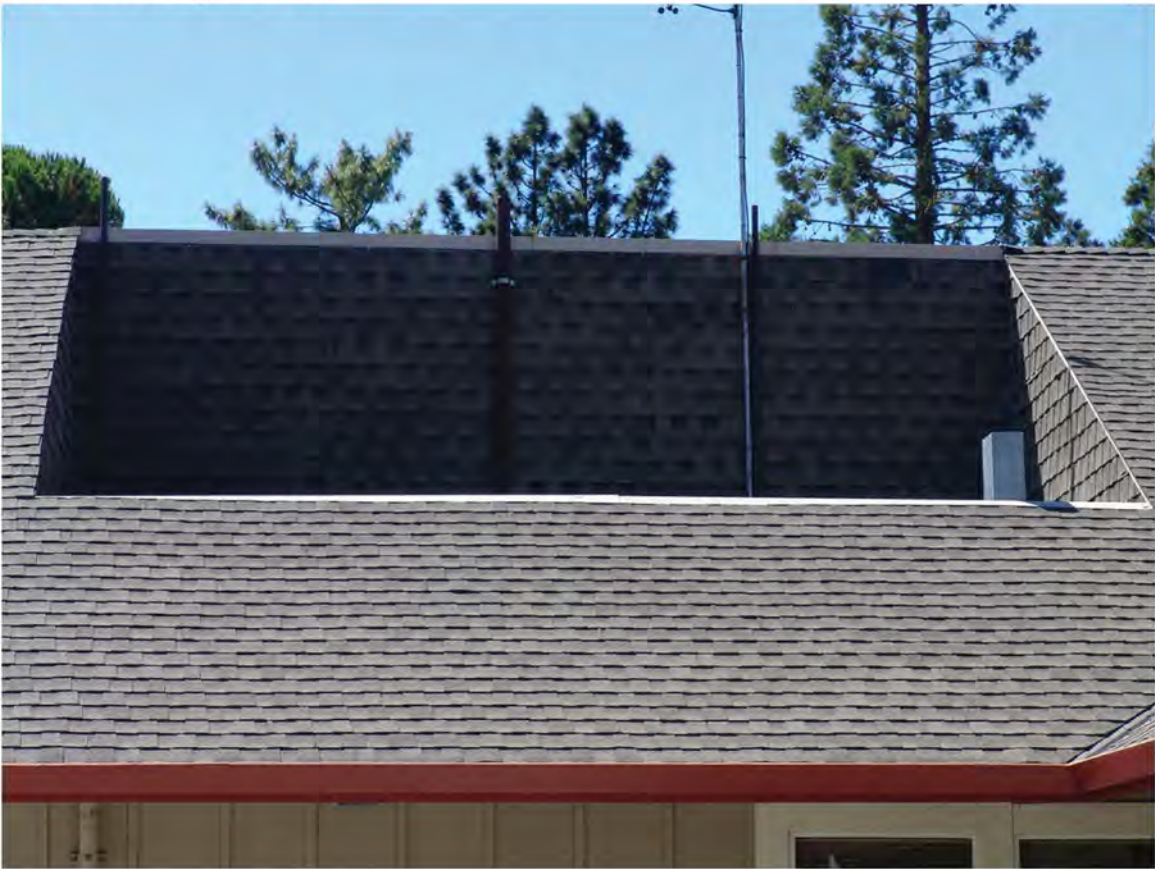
Existing Roof Well, Skyline Field Office, and Surroundings
